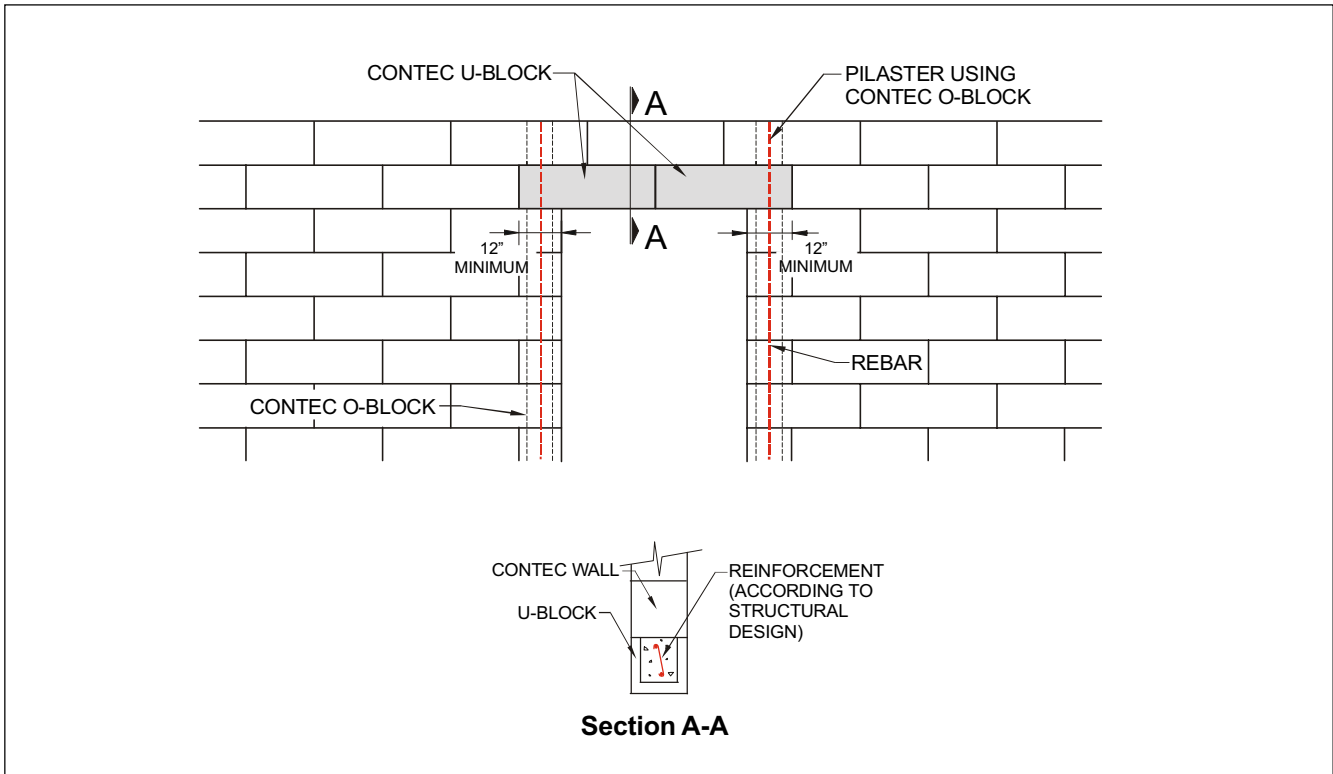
Contec U-Block beam used as lintel to span door and window openings.
